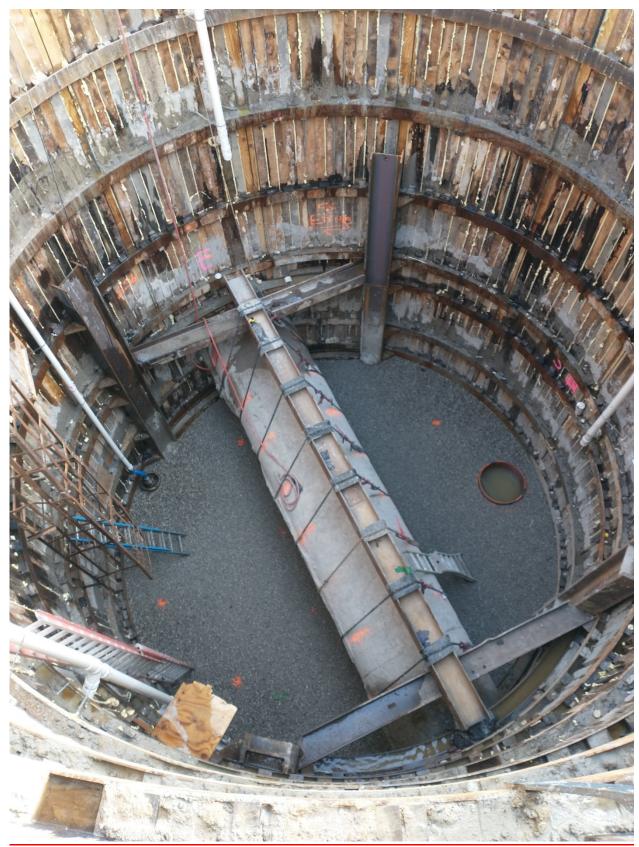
CS-13 Shaft Excavation Complete & Prepared for Concrete
